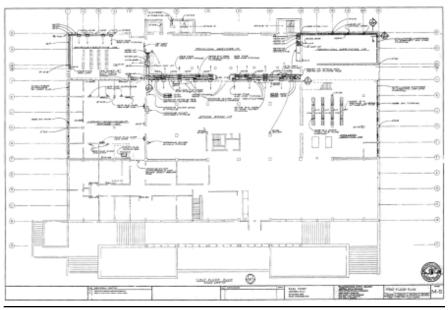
1970 drawing of the proposed addition to the Library prepared by Paul Thiry. Drawing courtesy of the Washington State Department of General Administration Archives.
